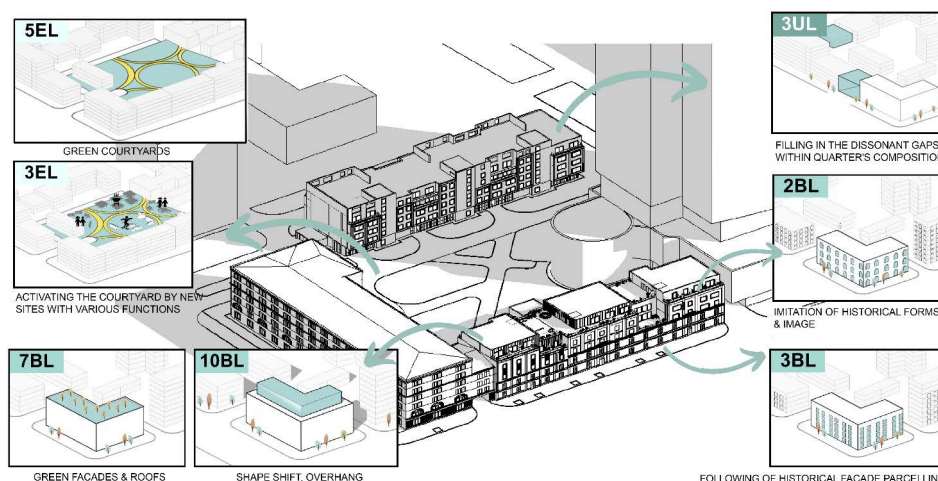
Techniques for the quarter's rebuilding (source: authors)
